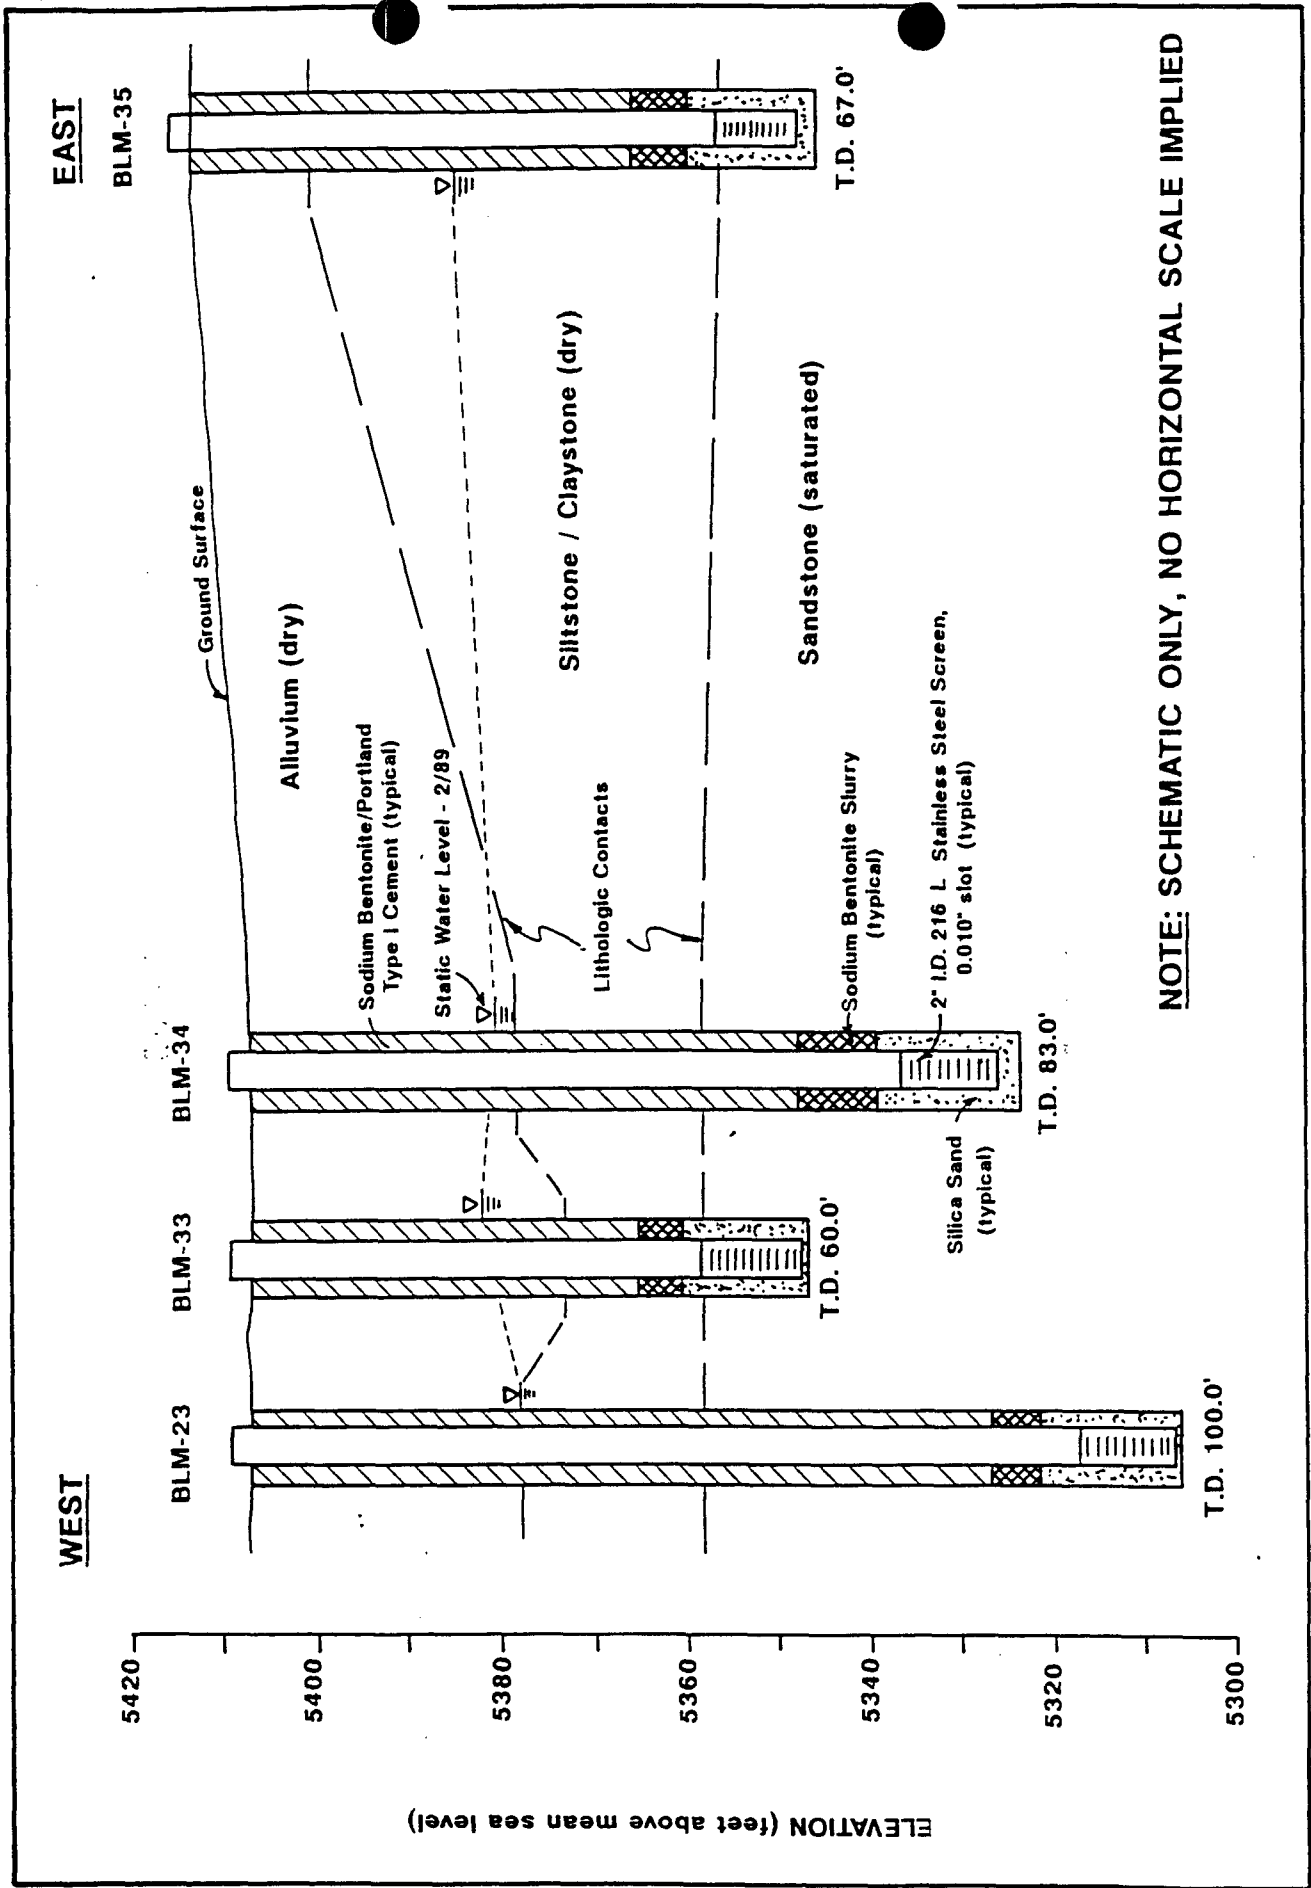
SCHEMATIC CROSS-SECTION - Lee Acres Landfill, Farmington, N.M.
